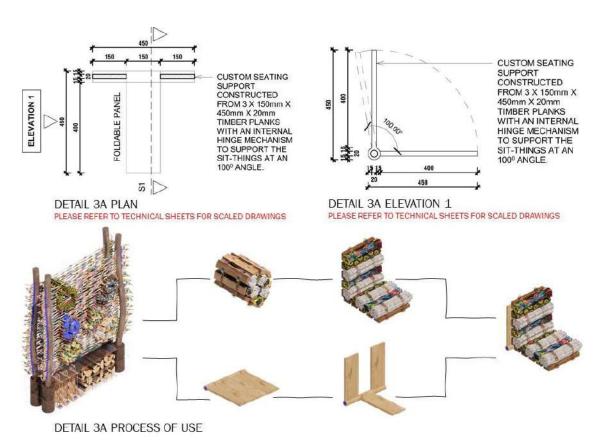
Technical drawings of detail 3A as specified (Author, 2021).
